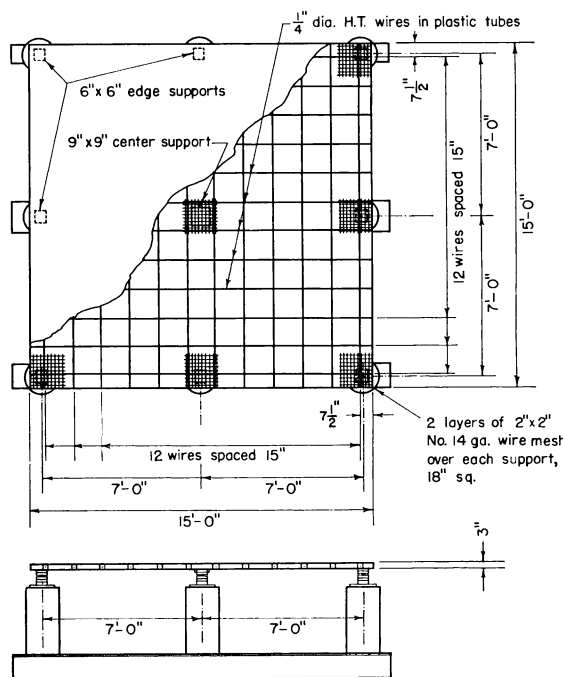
Plan and elevation of test slab, showing steel arrangement
